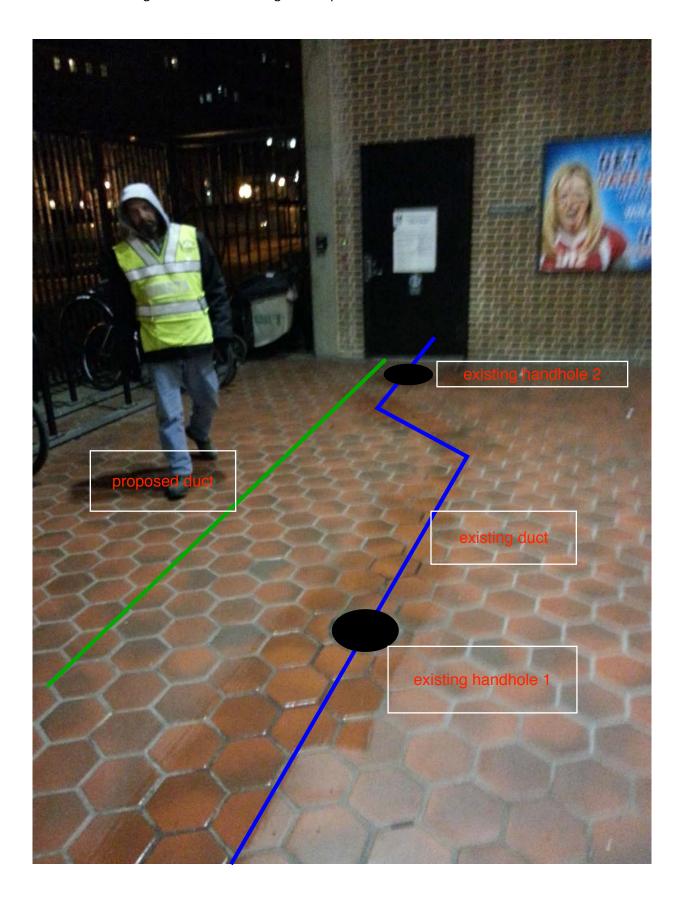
C13 King Street South: Existing duct and proposed duct /conduit transition in back rooms towards AFC panel
